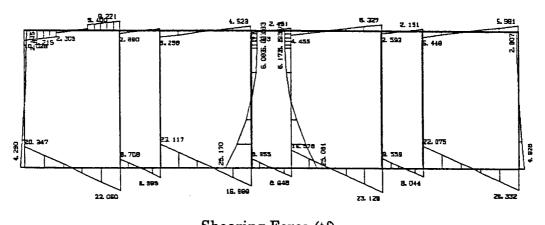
Load and Sectional Force of Box Culvert Section (Case 1)
